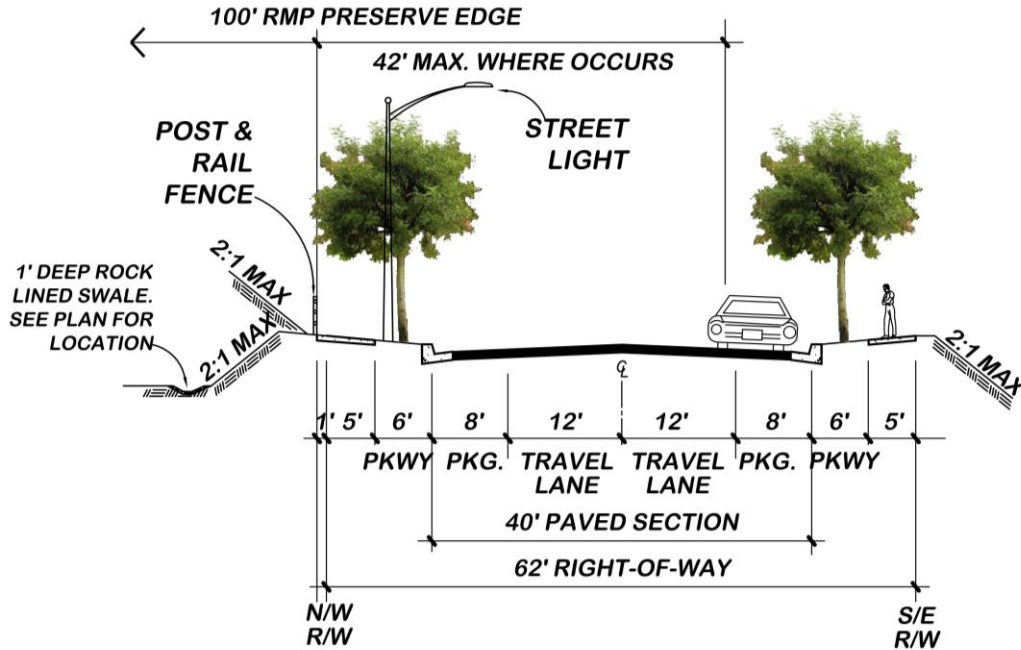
Modified Residential Collector (Street "A" and Street "N
